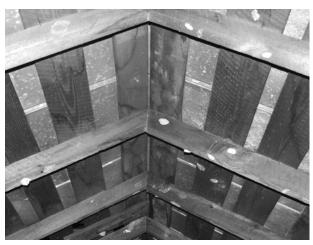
View of typical rafter connections and decking in 1925 addition.
